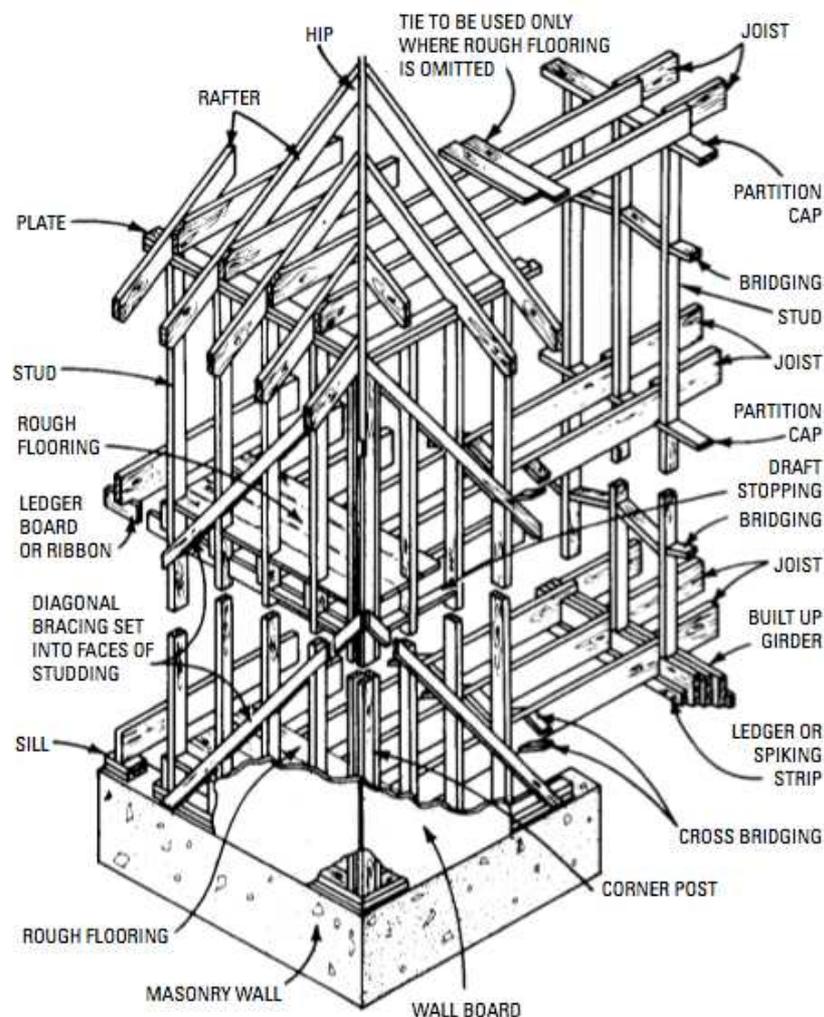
Details of balloon frame construction, [Jandl, 1983, page 47]
